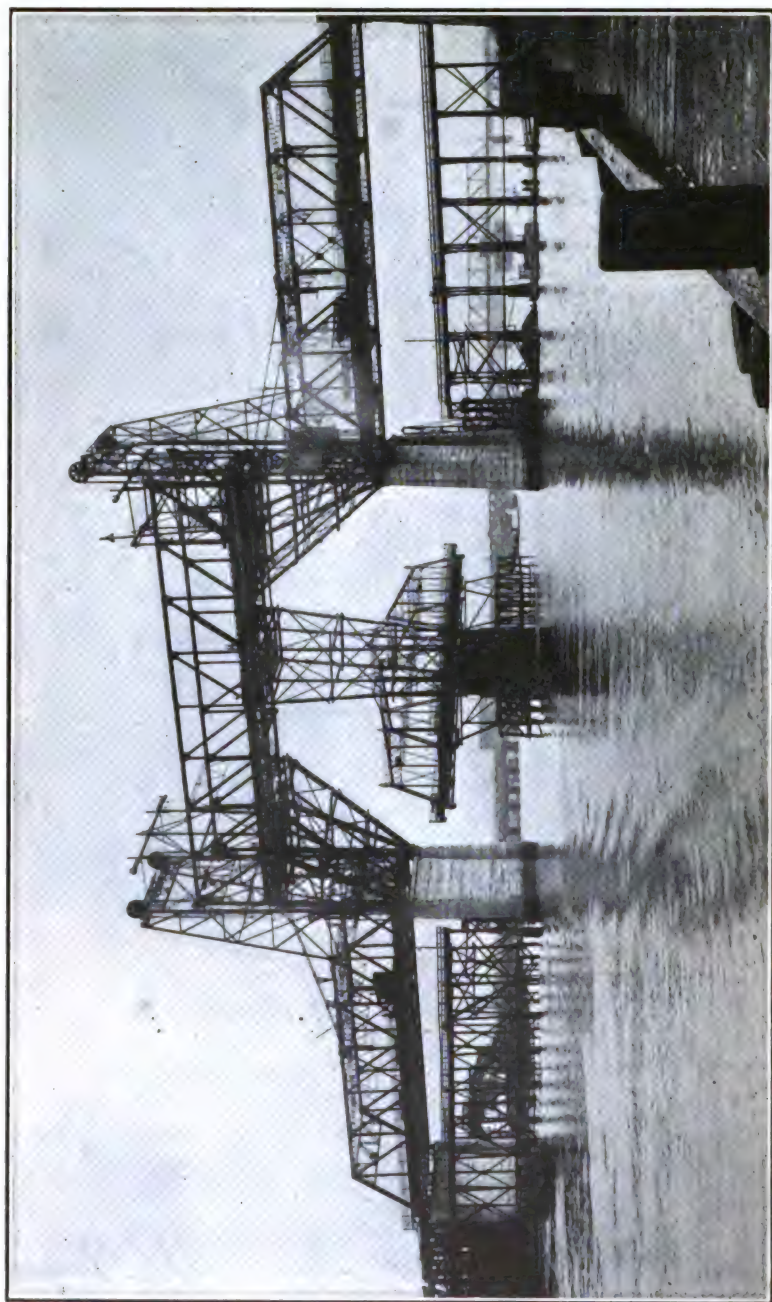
Old Tacoma Pier During Erection of New Bridge.
